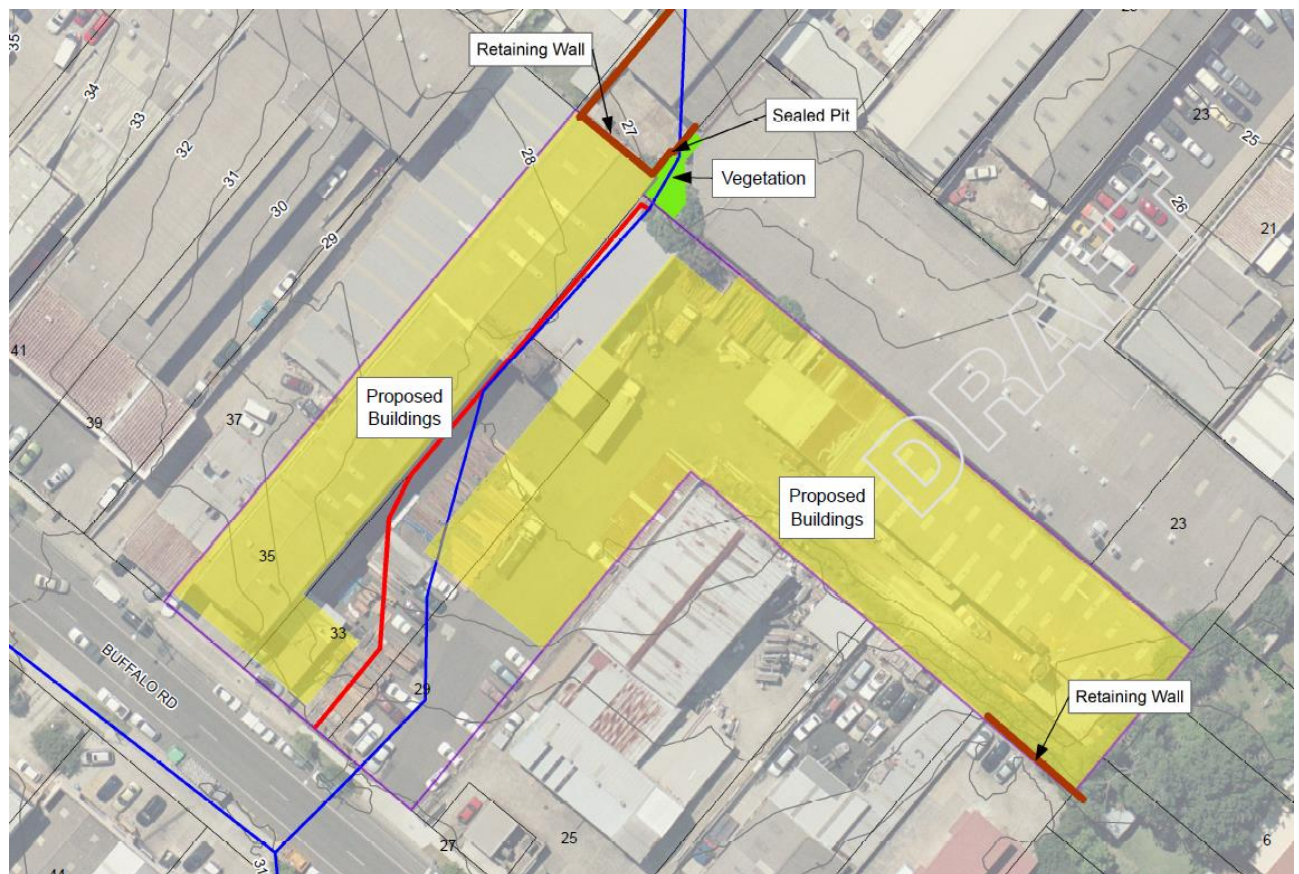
Proposed additional stormwater pipe (in red) parallel to the existing stormwater pipe (in blue).
